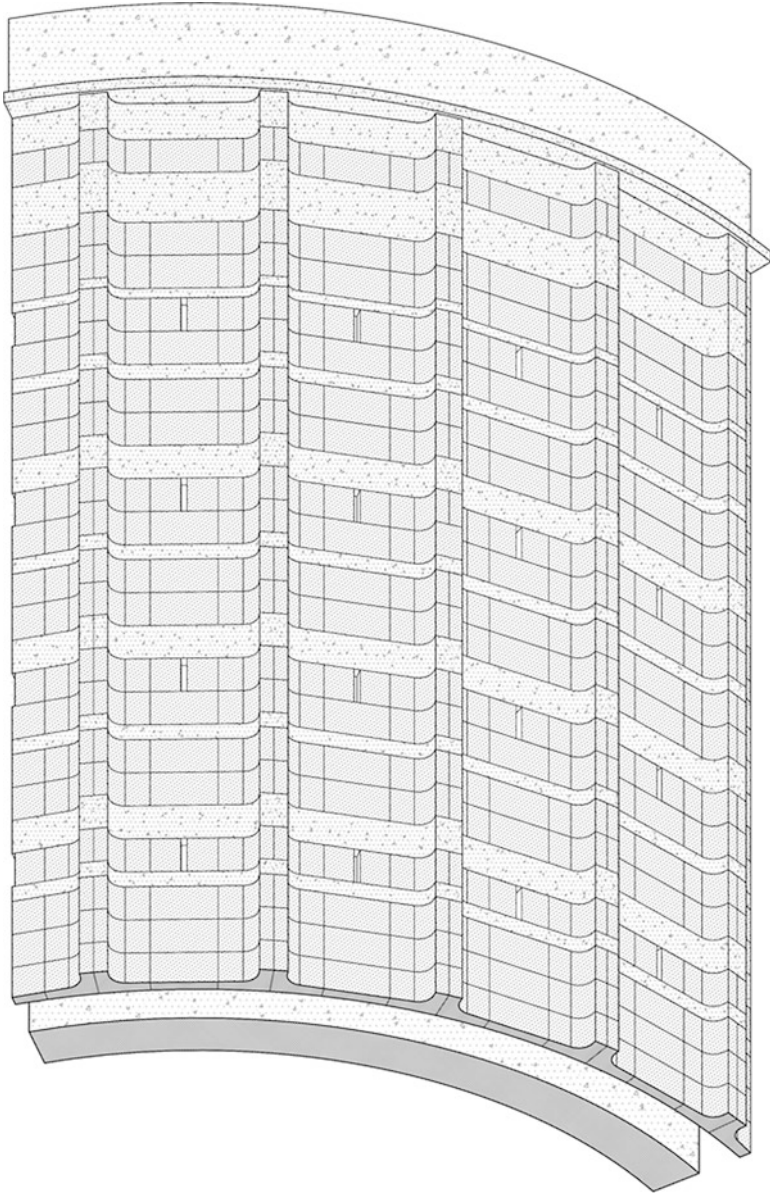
Detailed axonometry of the external wall of the Water Tank, described as an excavated and lightened masonry wall, configured as a ribbed wall. (Drawing by Nicola Panzini)
